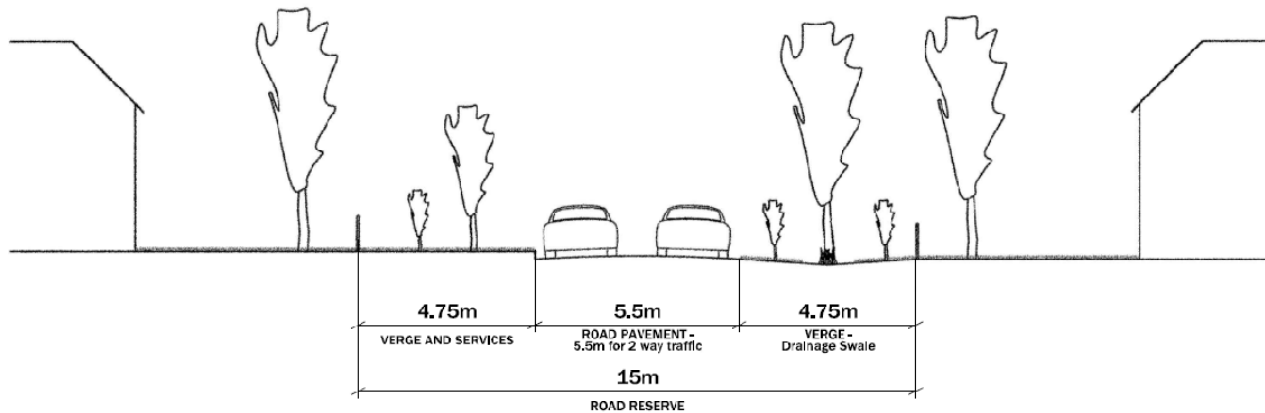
Cross section for typical internal 15m road reserve for access streets.
